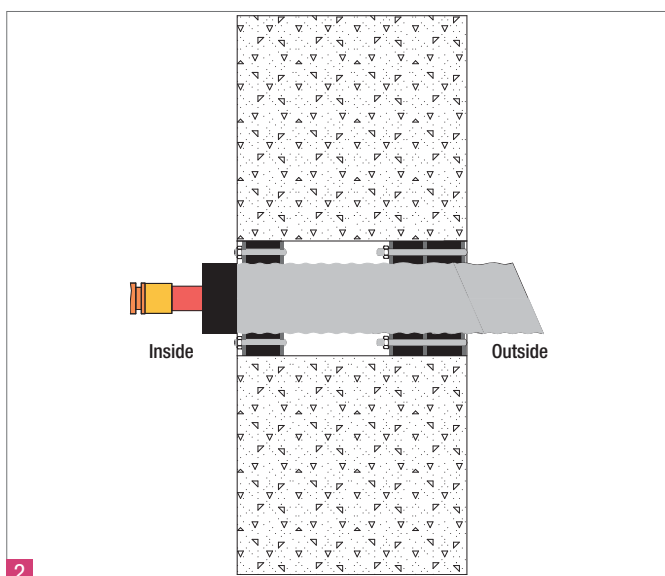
Compression wall seal FA 80 and FA 40, water under pressure, side view
